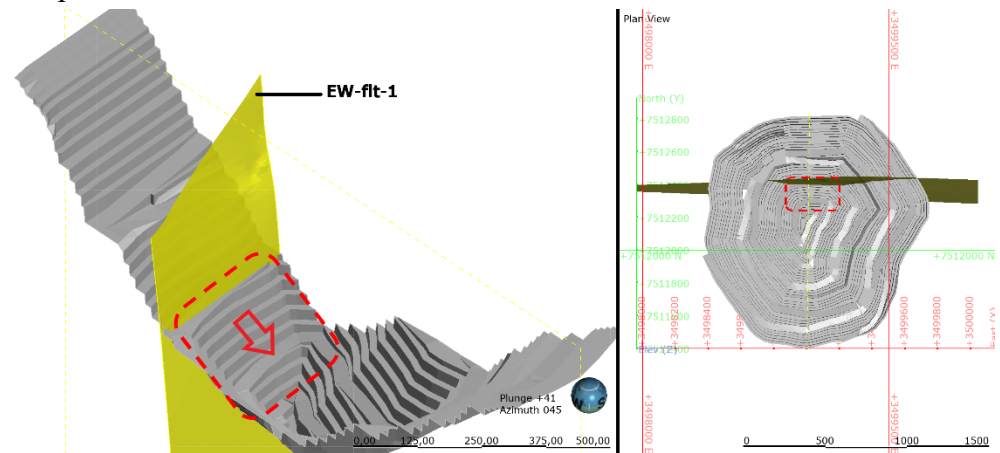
Slice of 3D view of Stage 5 pit. Potentil planar failure from EW-flt-1 in the north wall.
